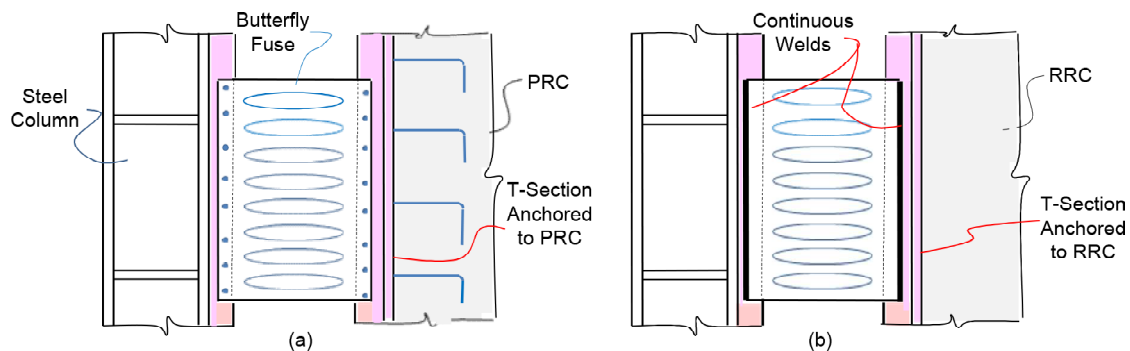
Generic replaceable shear fuses, (a) Bolted to continuous side plates/steel sections and (b) Welded to continuous side plates/steel sections (not all details shown for clarity).
